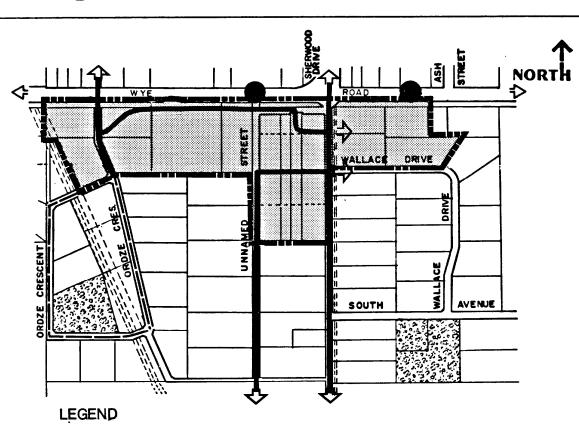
AREA ROADWAY NETWORK OPTION No.2 [CLOSE EXISTING RESIDENTIAL CONNECTIONS]
